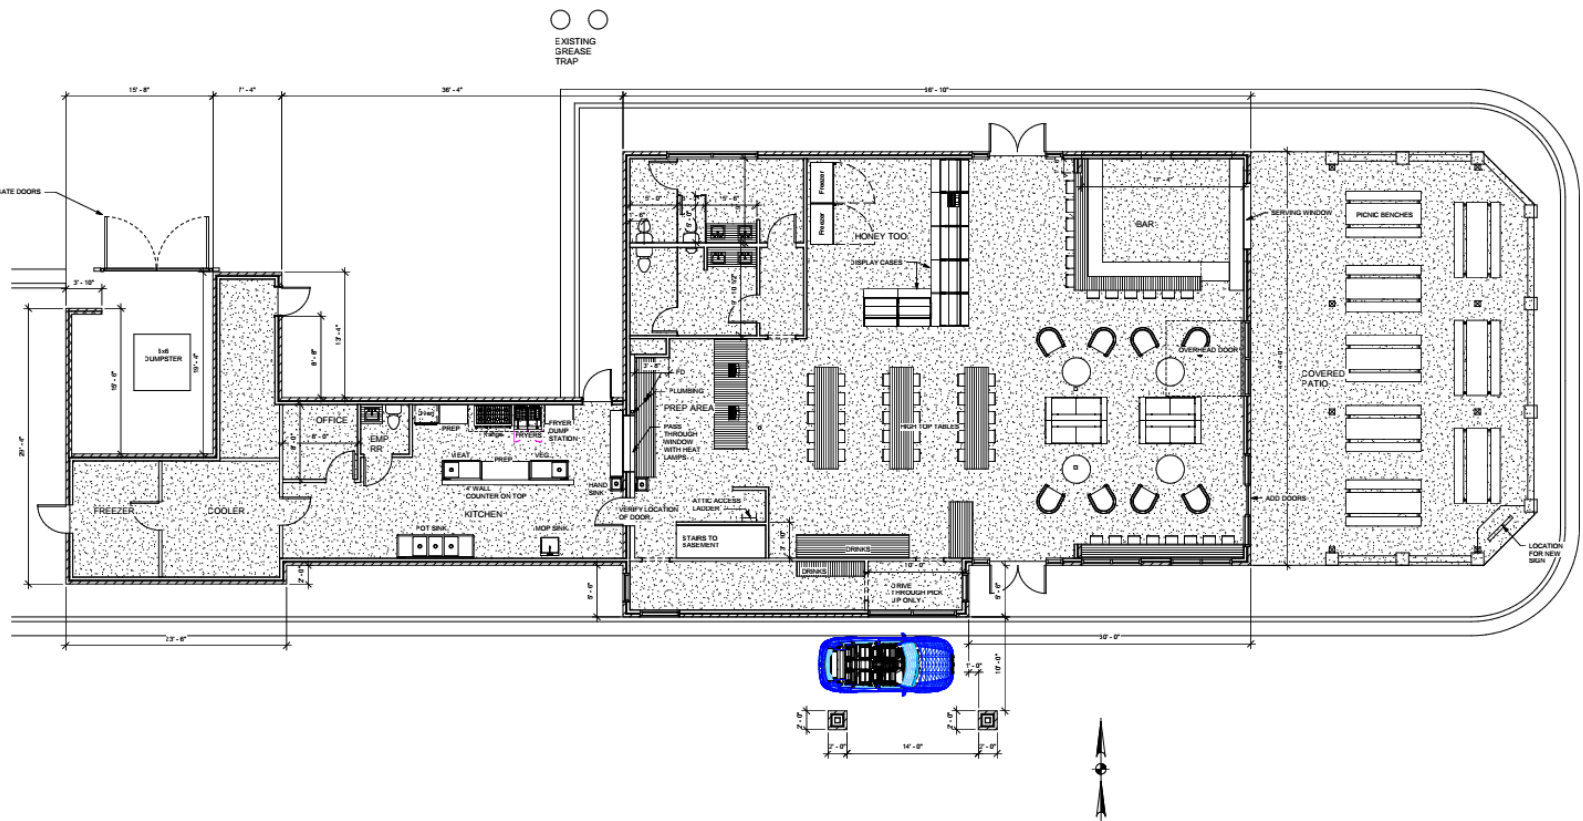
EXHIBIT E: Proposed Architectural Rendering and Floor Plan
